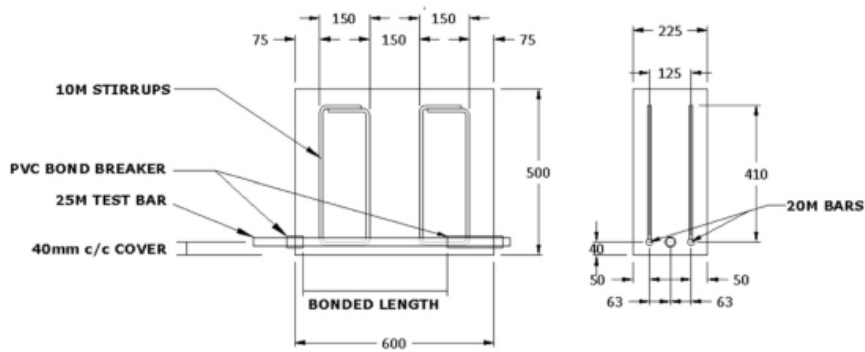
Beam-end specimen dimensions and reinforcement details (Butler *et al.*, 2011)
